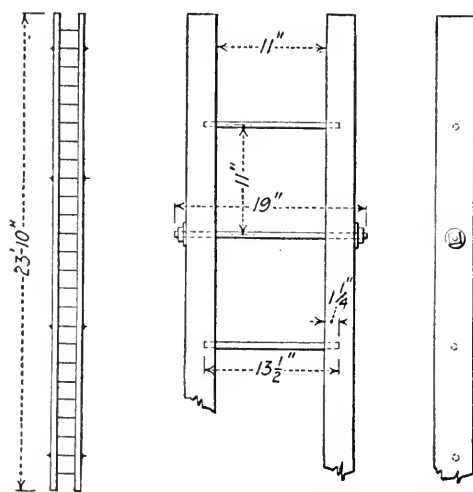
LADDER OF 3 X 4-IN. UPRIGHTS AND 1/2-IN. STEEL RUNGS.
